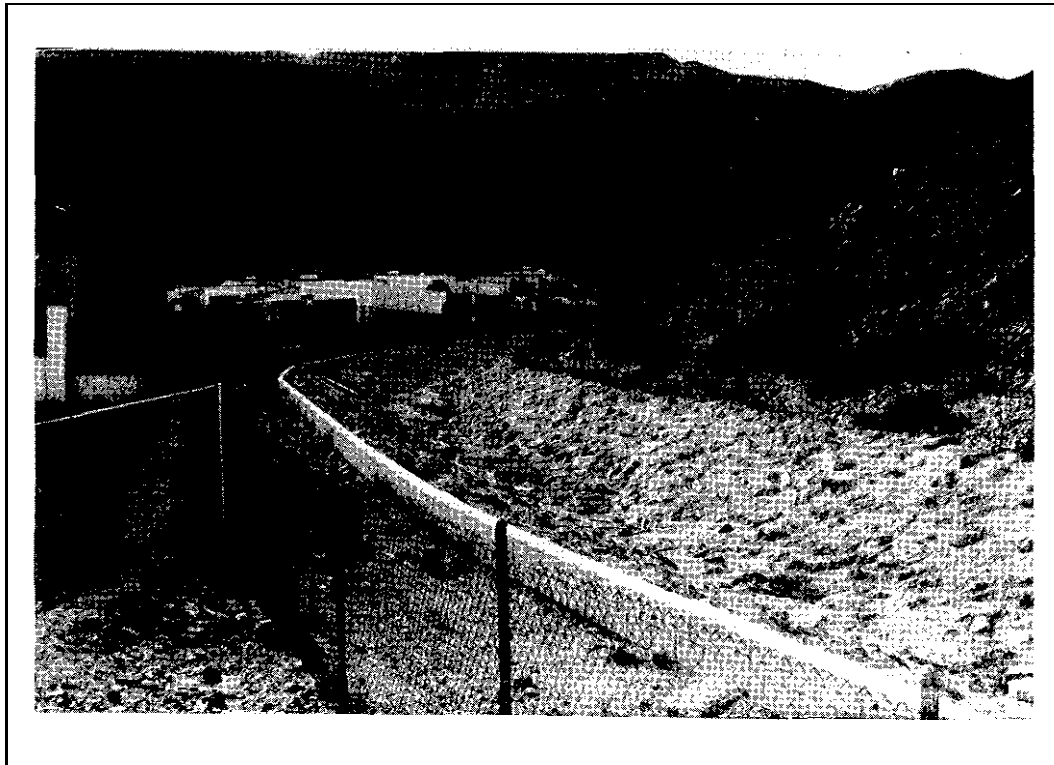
Low Concrete Wall on Outside Bend of Magnesia Canyon Channel, Rancho Mirage, California
